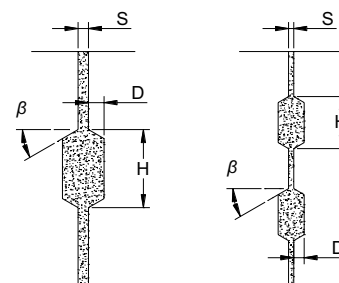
Shape of longitudinal joint – single shear key & double shear keys
